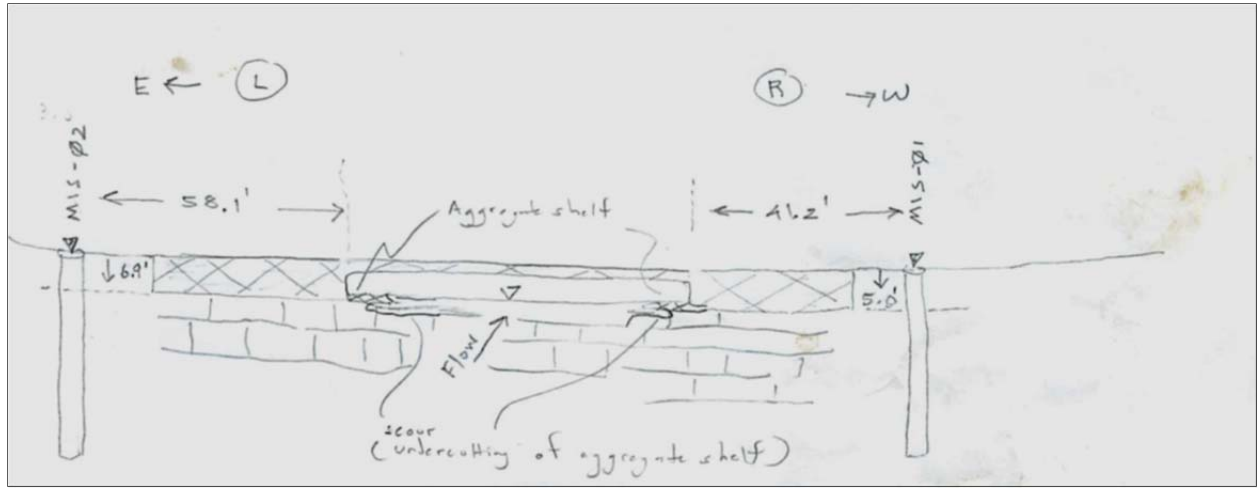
Field sketch of Mish Road Bridge, looking downstream.
